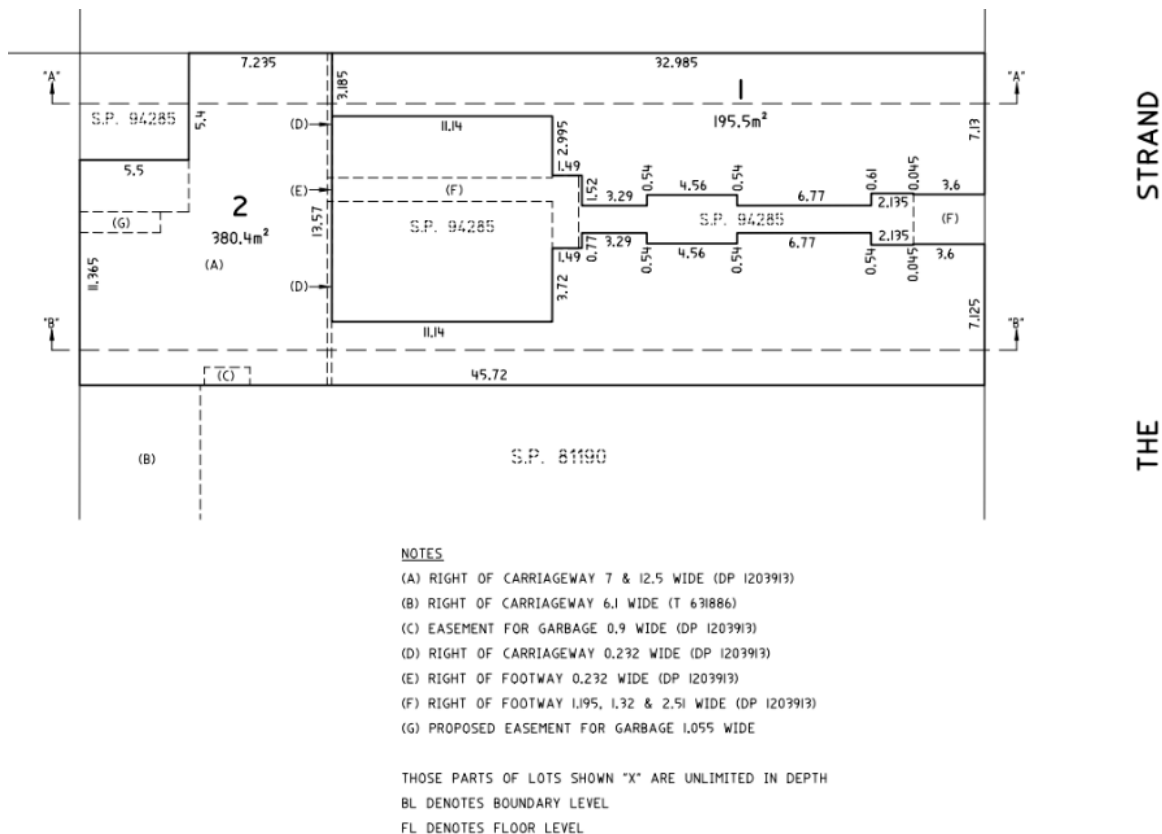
Proposed Stratum subdivision plan to create Lot 1 and Lot 2
